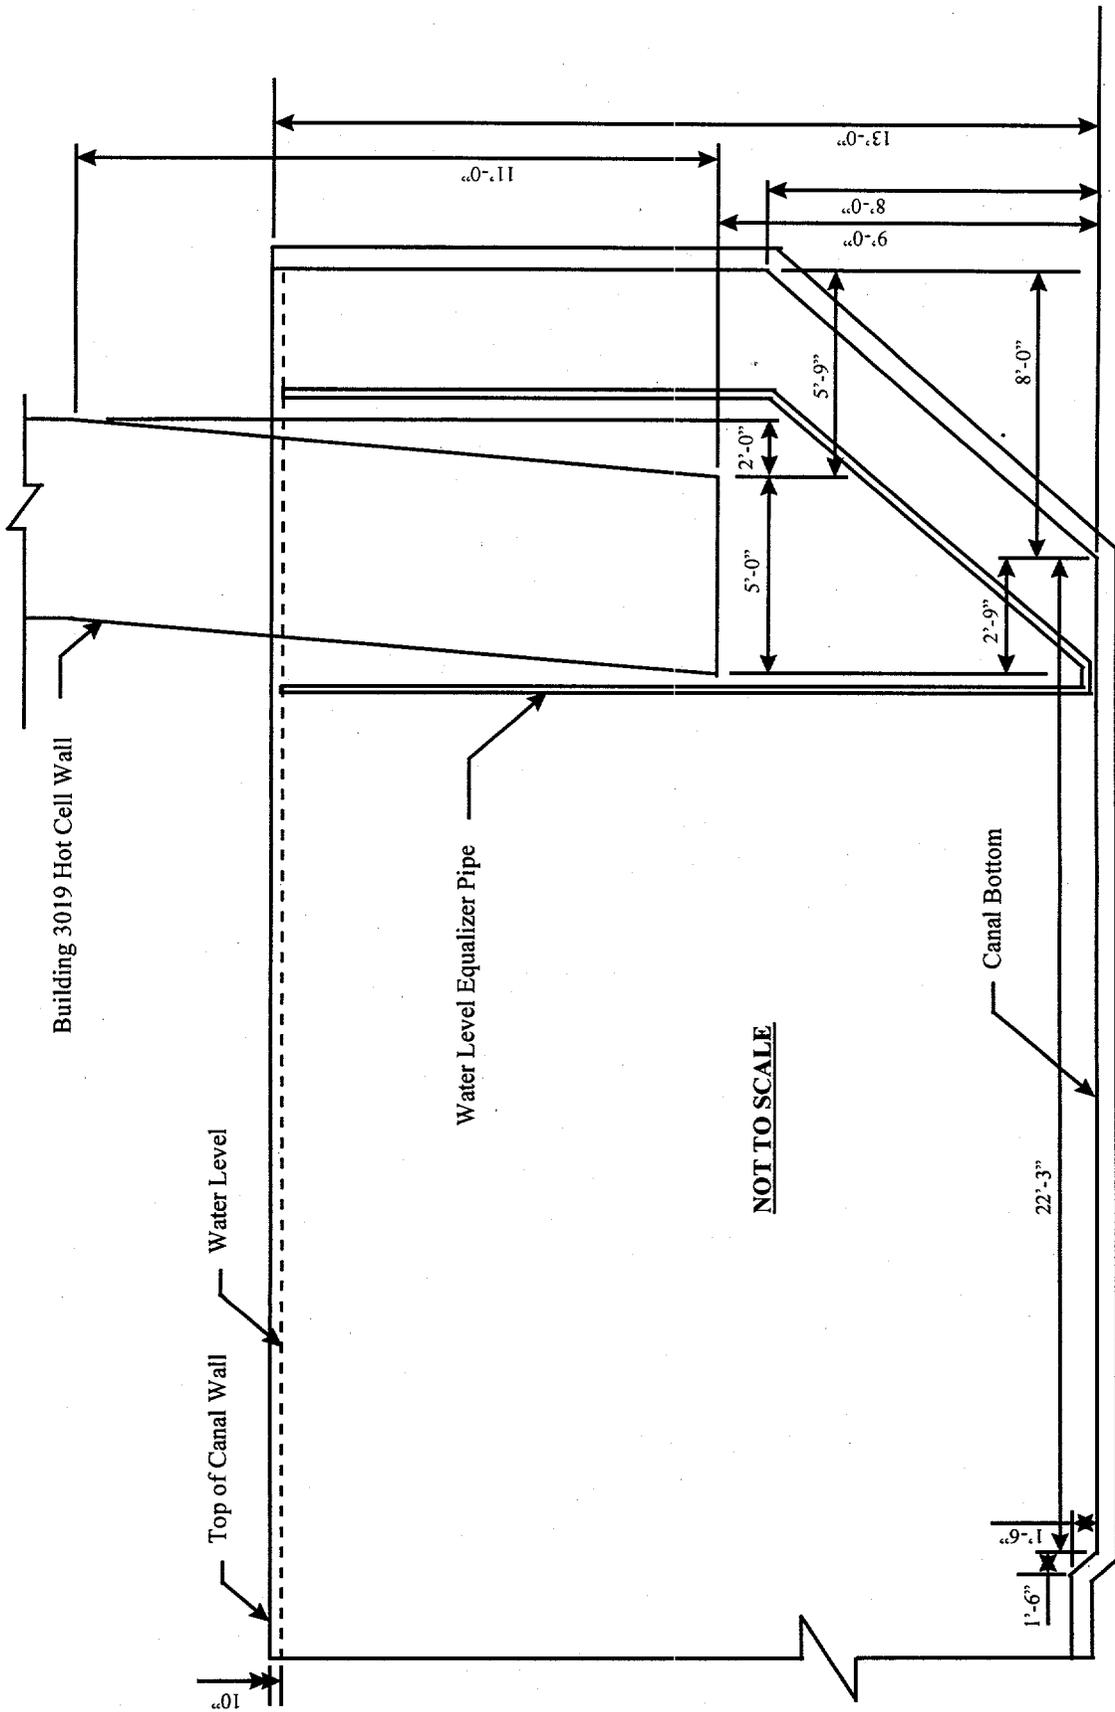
Longitudinal Section of Building 3001 Storage Canal at Building 3019 Air Dam
